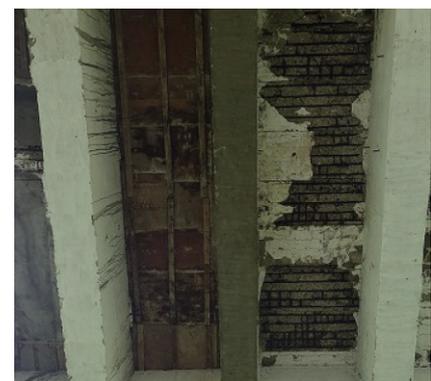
Damaged RC slabs of the bridge (Rakhine)
